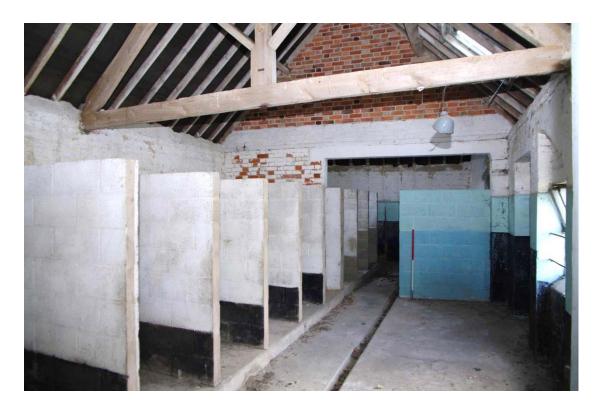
North range, Building C inside Looking north-east, 1m scale. Note supporting brick wall
